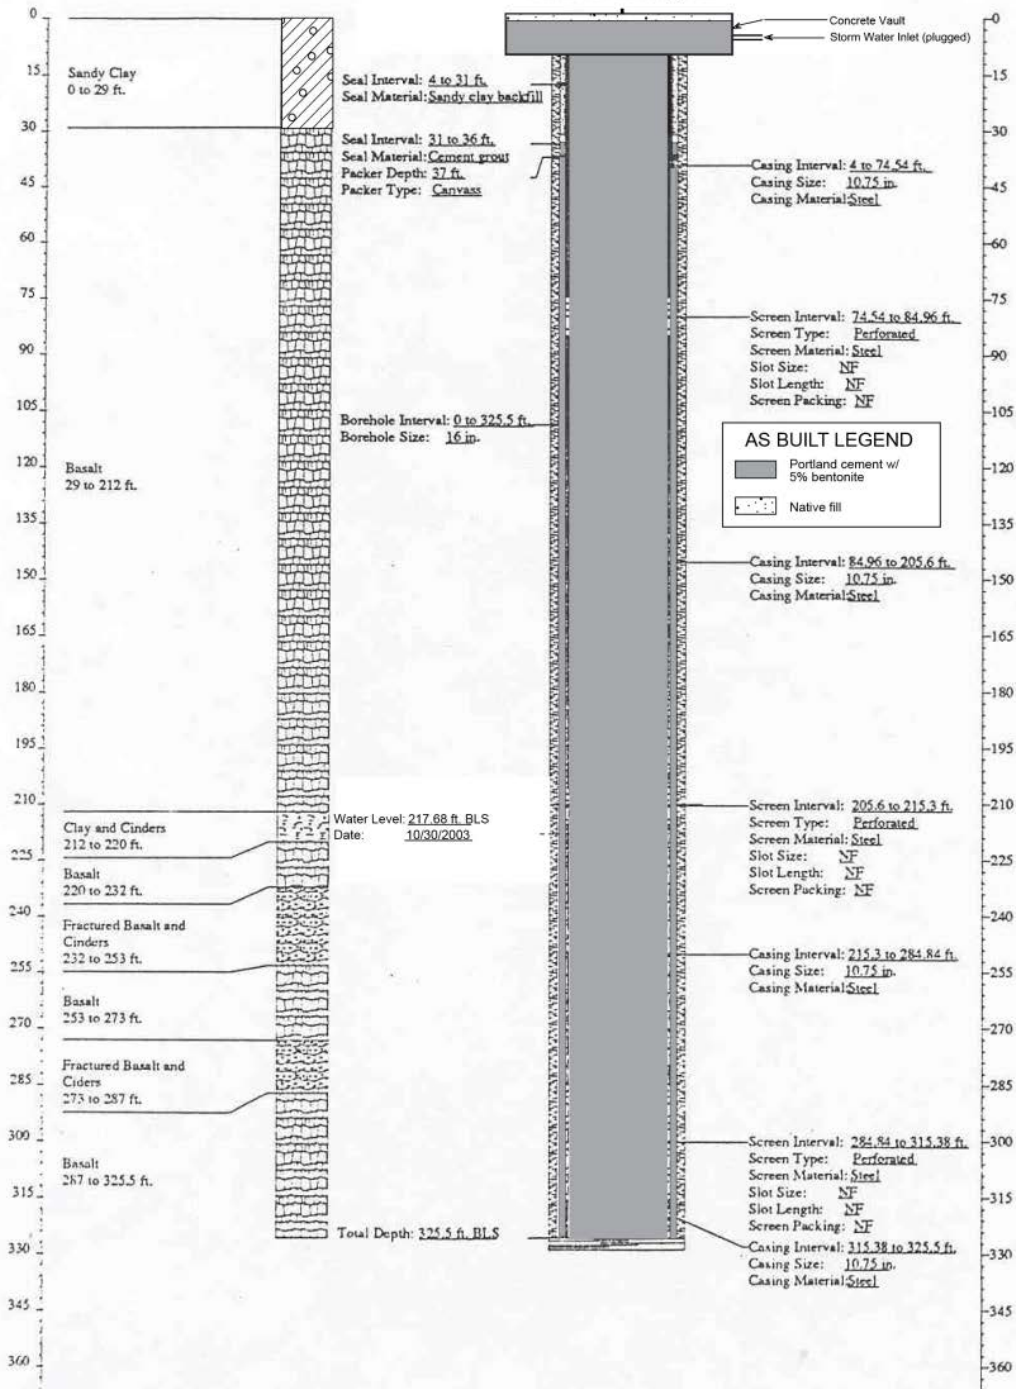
Construction diagram showing decommissioned storm water injection well TAN DRAINAGE DISP. 01
